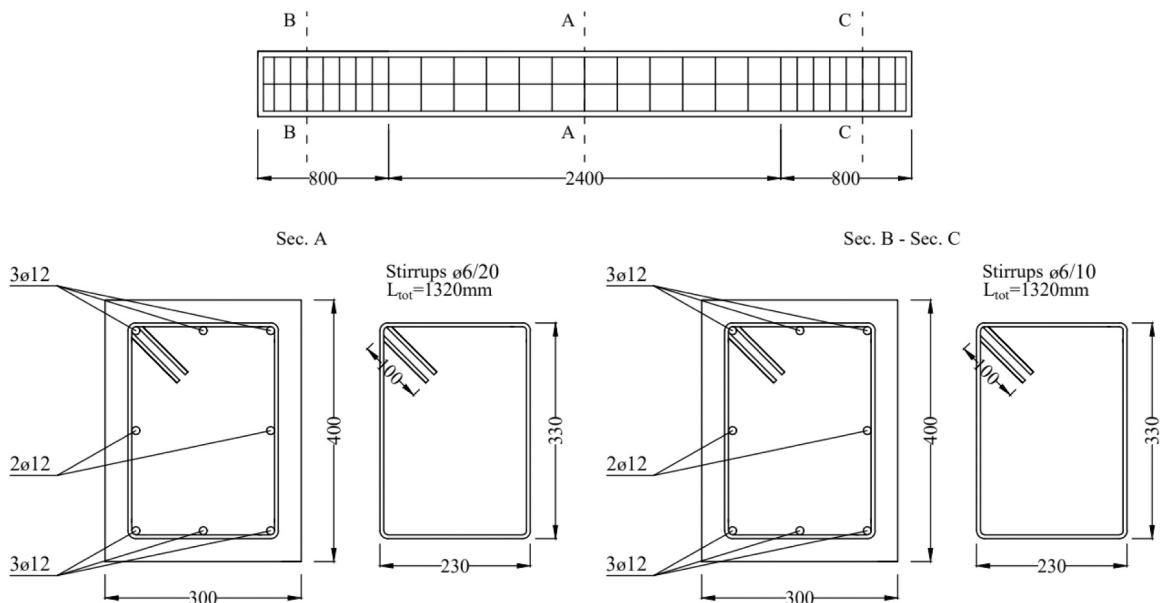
B_SE772: layout of the longitudinal and shear steel reinforcements.
